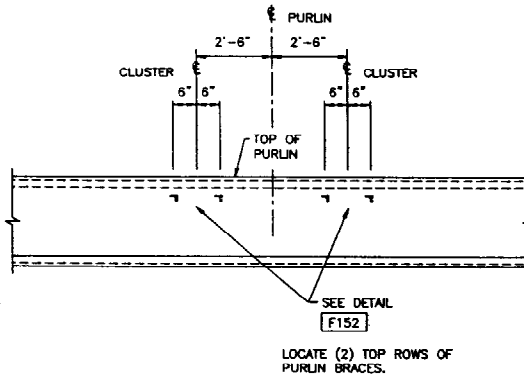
CONTINUOUS SPAN PURLIN CONNECTION INTERMEDIATE LOCATION - 9-1/2" PURLIN
